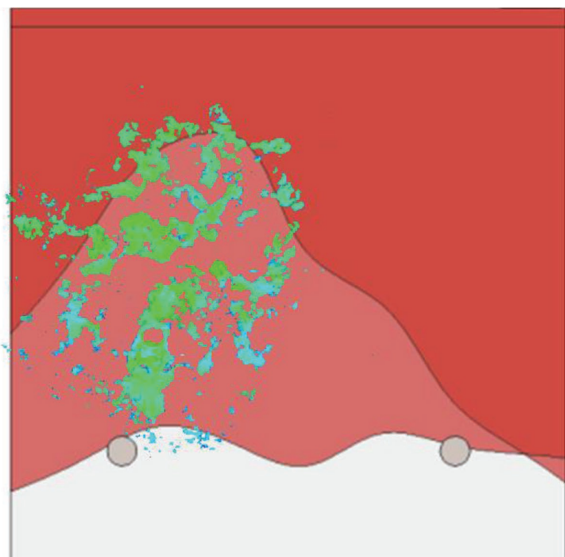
Schematic cross-section view of the crack zone of a concrete beam. Red areas mark the determination of the crack depth by UPV method (comparable to Figure 11). In parallel, additional fluorescent pigments (green) within the epoxy precursors mark the area of self-healing.
